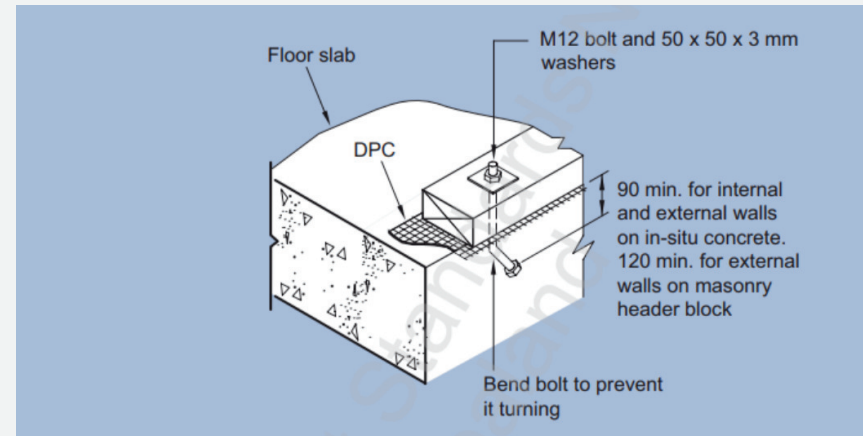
image showing plate fixing details in response to Processing Checklist B1 Structure / Framing Source: NZS3604:2011, p.7-39
